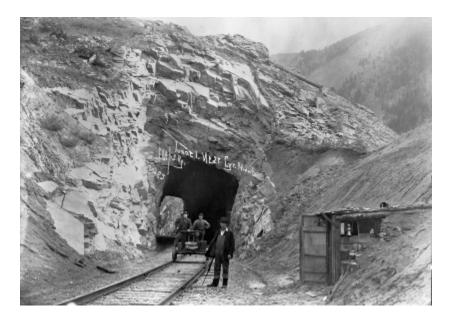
Historic photo of west portal of Tunnel No. 18 on the Milwaukee Road Railroad grade. Photo circa 1914.
